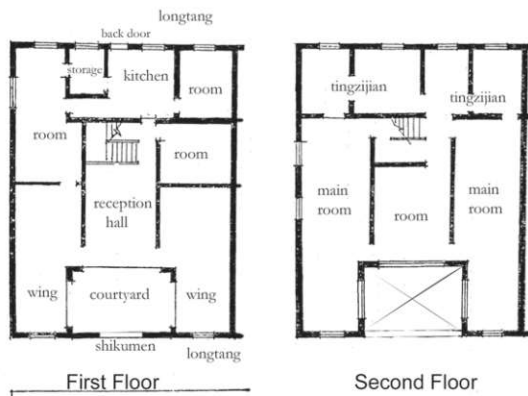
Plan of first and second floors of a typical li house in the foreign settlements of Shanghai, ca. 1910–30
